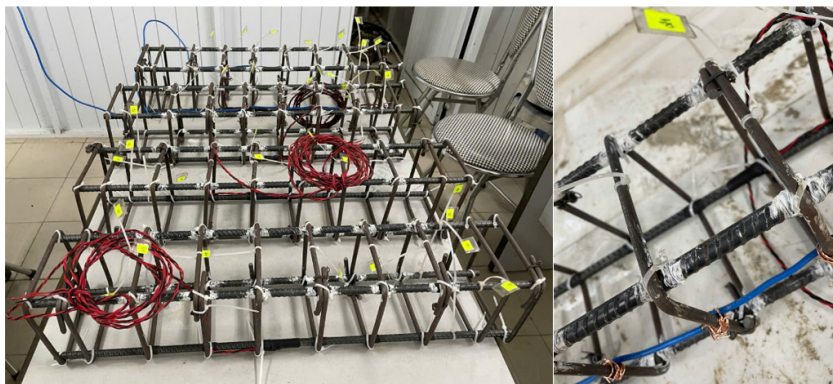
Reinforcing steel cages of RC columns (Groups 2 and 3)
